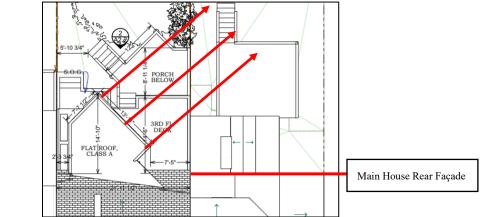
Delano Avenue, 311 Notification Plans, 3/23/15, Case No. 2015.004262, SF Planning Department website
